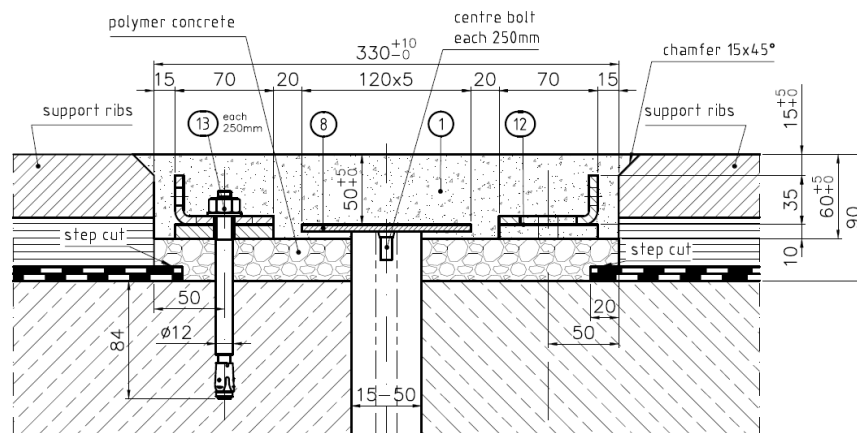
Cross section of new PU-type carriageway joint at Welland Canal Lock 2 Road Bridge
